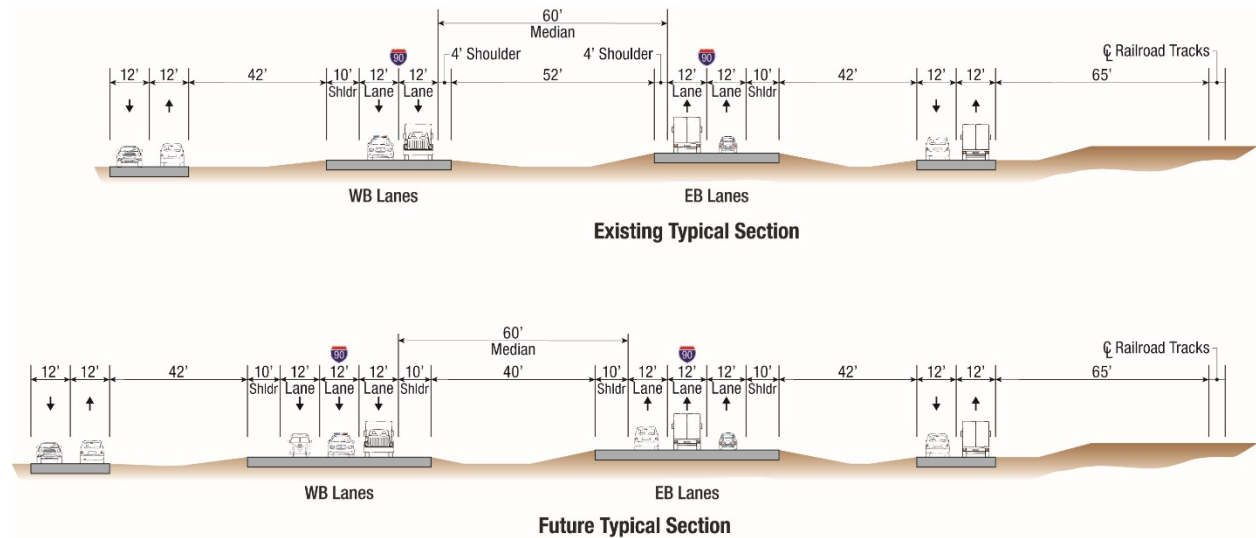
illustrates the proposed widening through existing and proposed typical sections. Note the outside lane in both directions is the proposed auxiliary lane.
